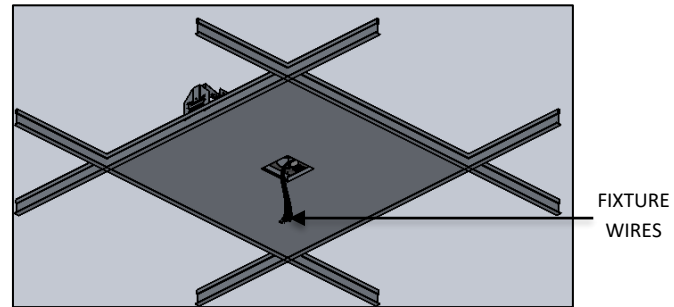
ASSEMBLED VIEW SHOWING RECESSED J-BOX TO THE CEILING
